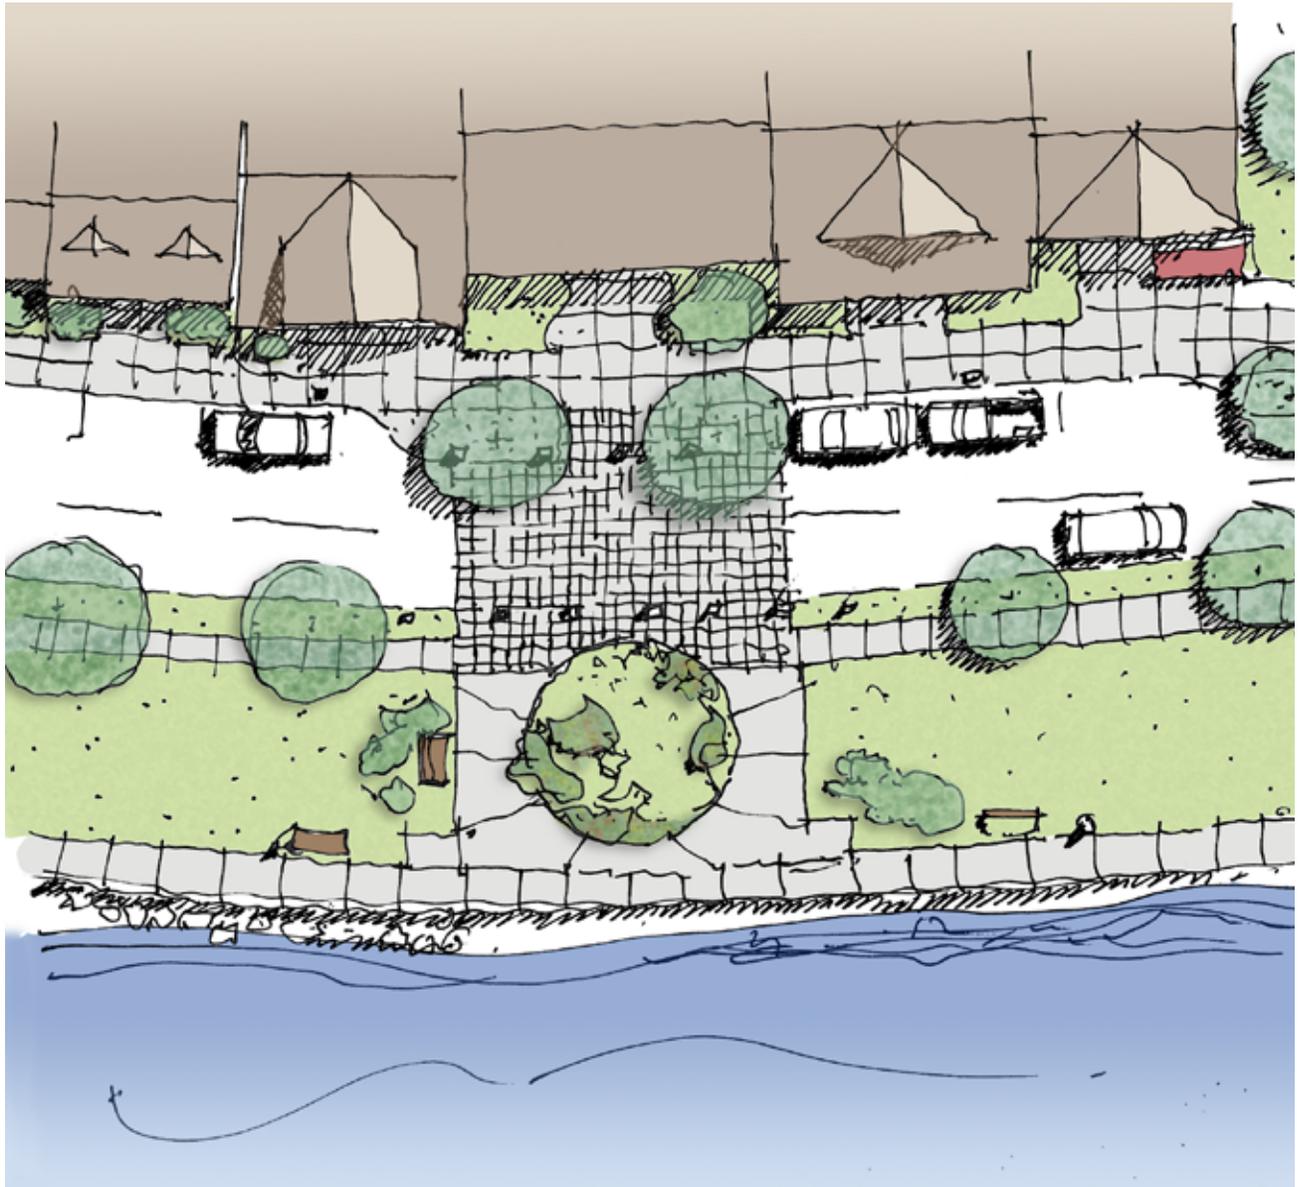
Section Diagram: Riverfront Building, Street and Open Space Relationships
